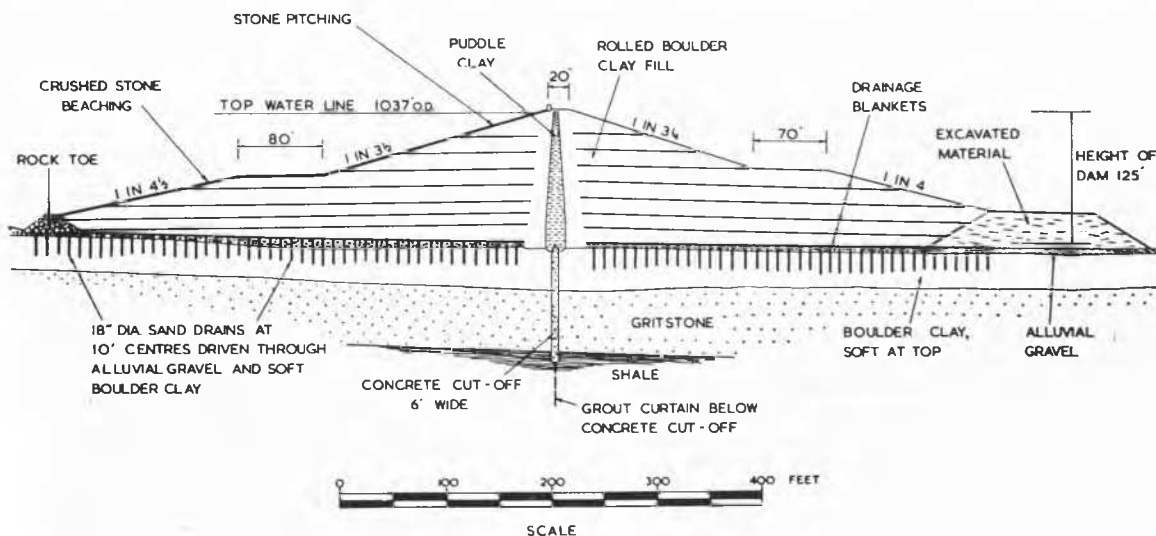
Selsset Reservoir : Typical cross-section of embankment.
